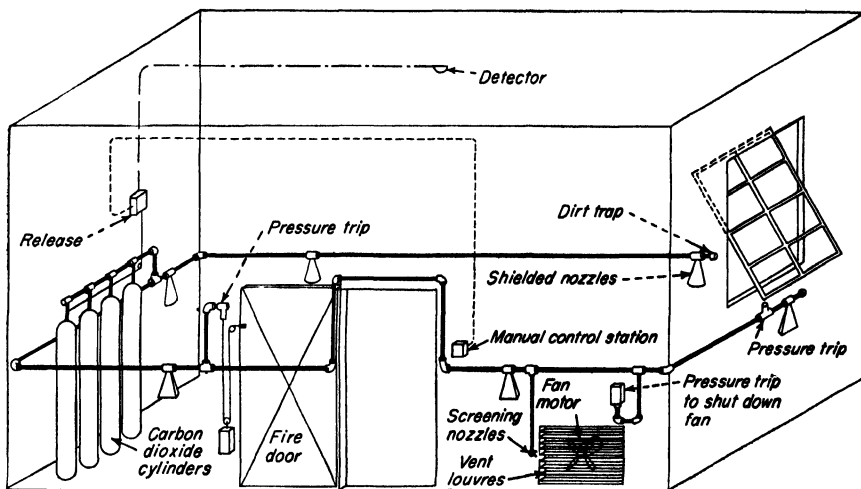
Diagrammatic layout of typical total-flooding installation. (Walter Kidde & Co.)
